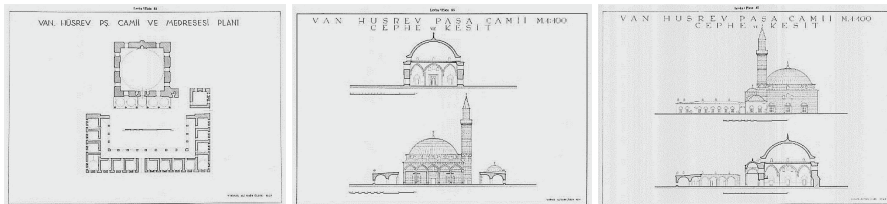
Plan, Cross-Section and Views of Husrev Pasha Mosque and Madrasa (URL 6)
